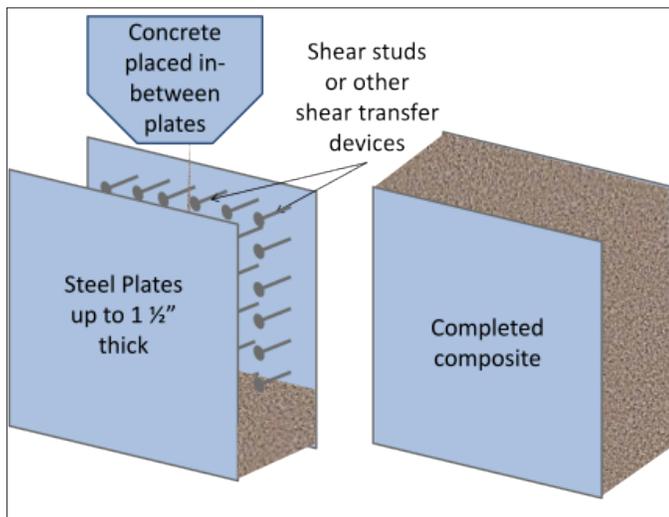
Schematic of steel plate and concrete composite modular construction.
